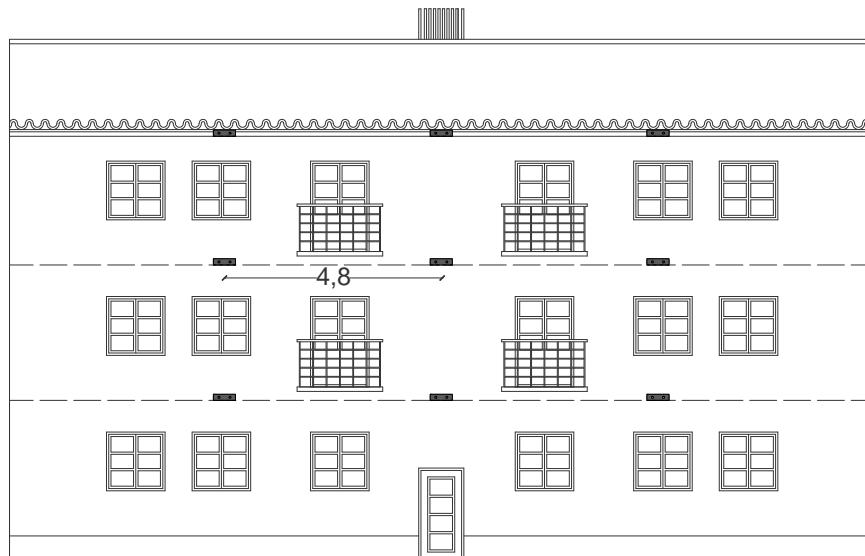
Schematic representation of the wall-to-floor strengthening solution.
